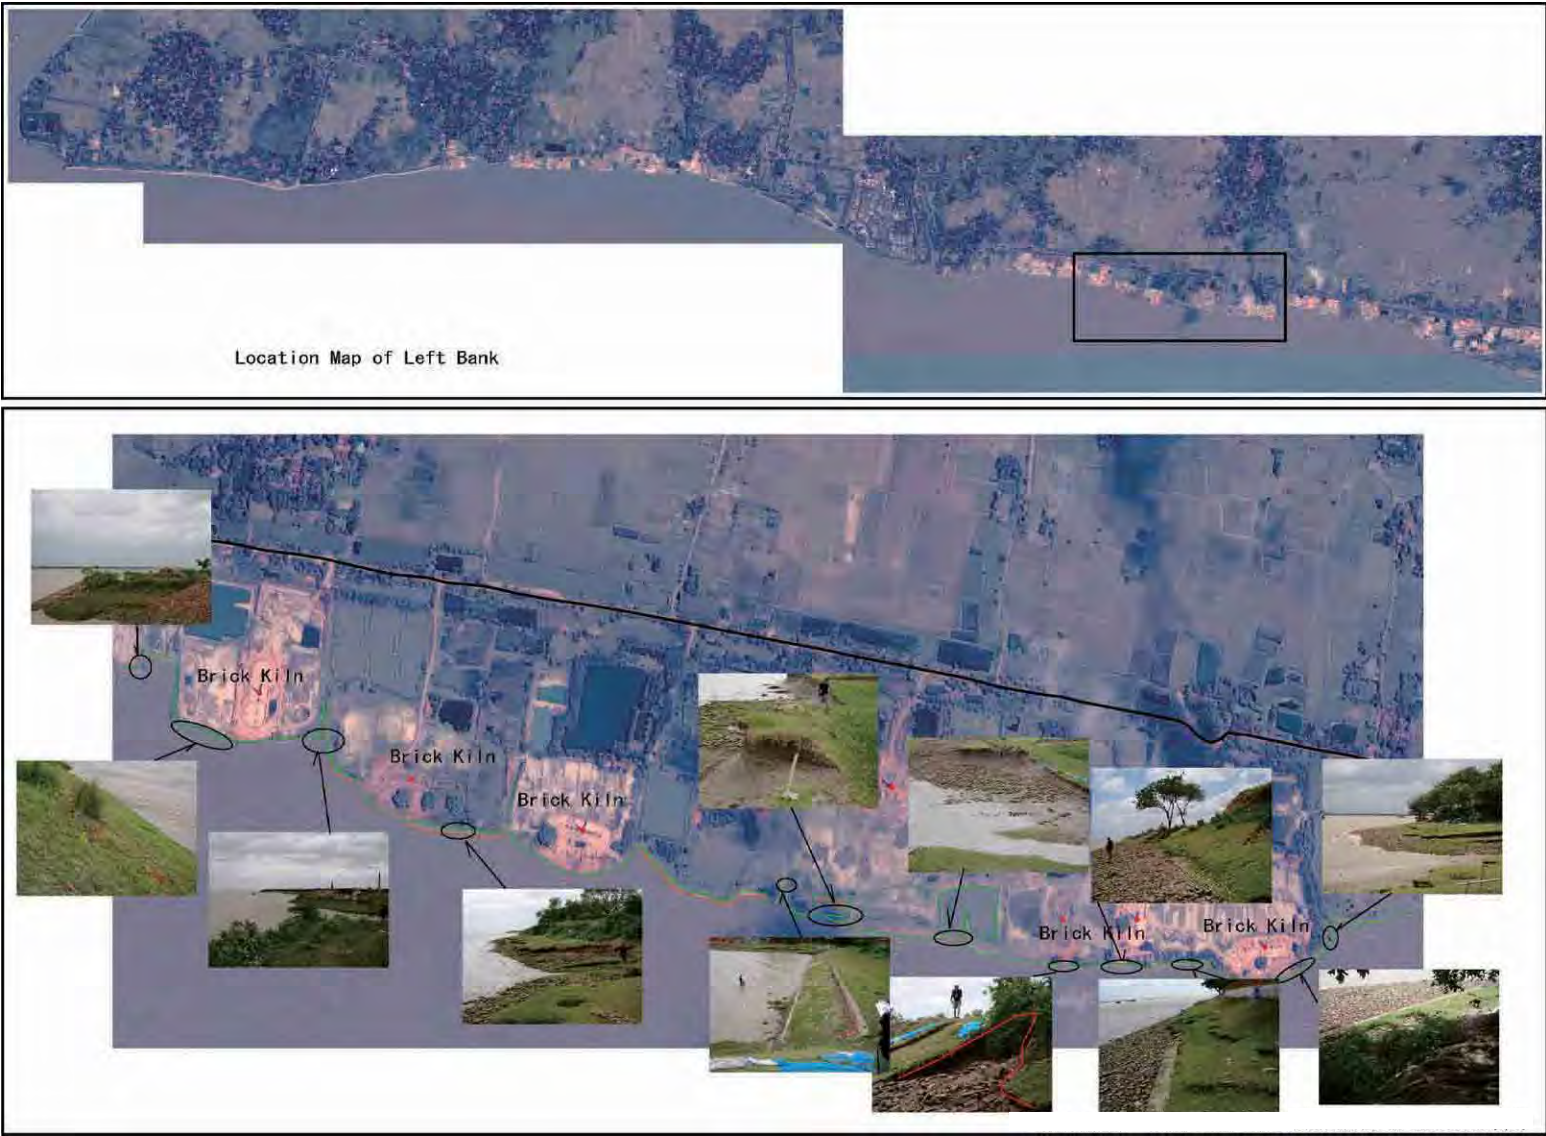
River Bank Protection Works at Left Bank (6/6)
